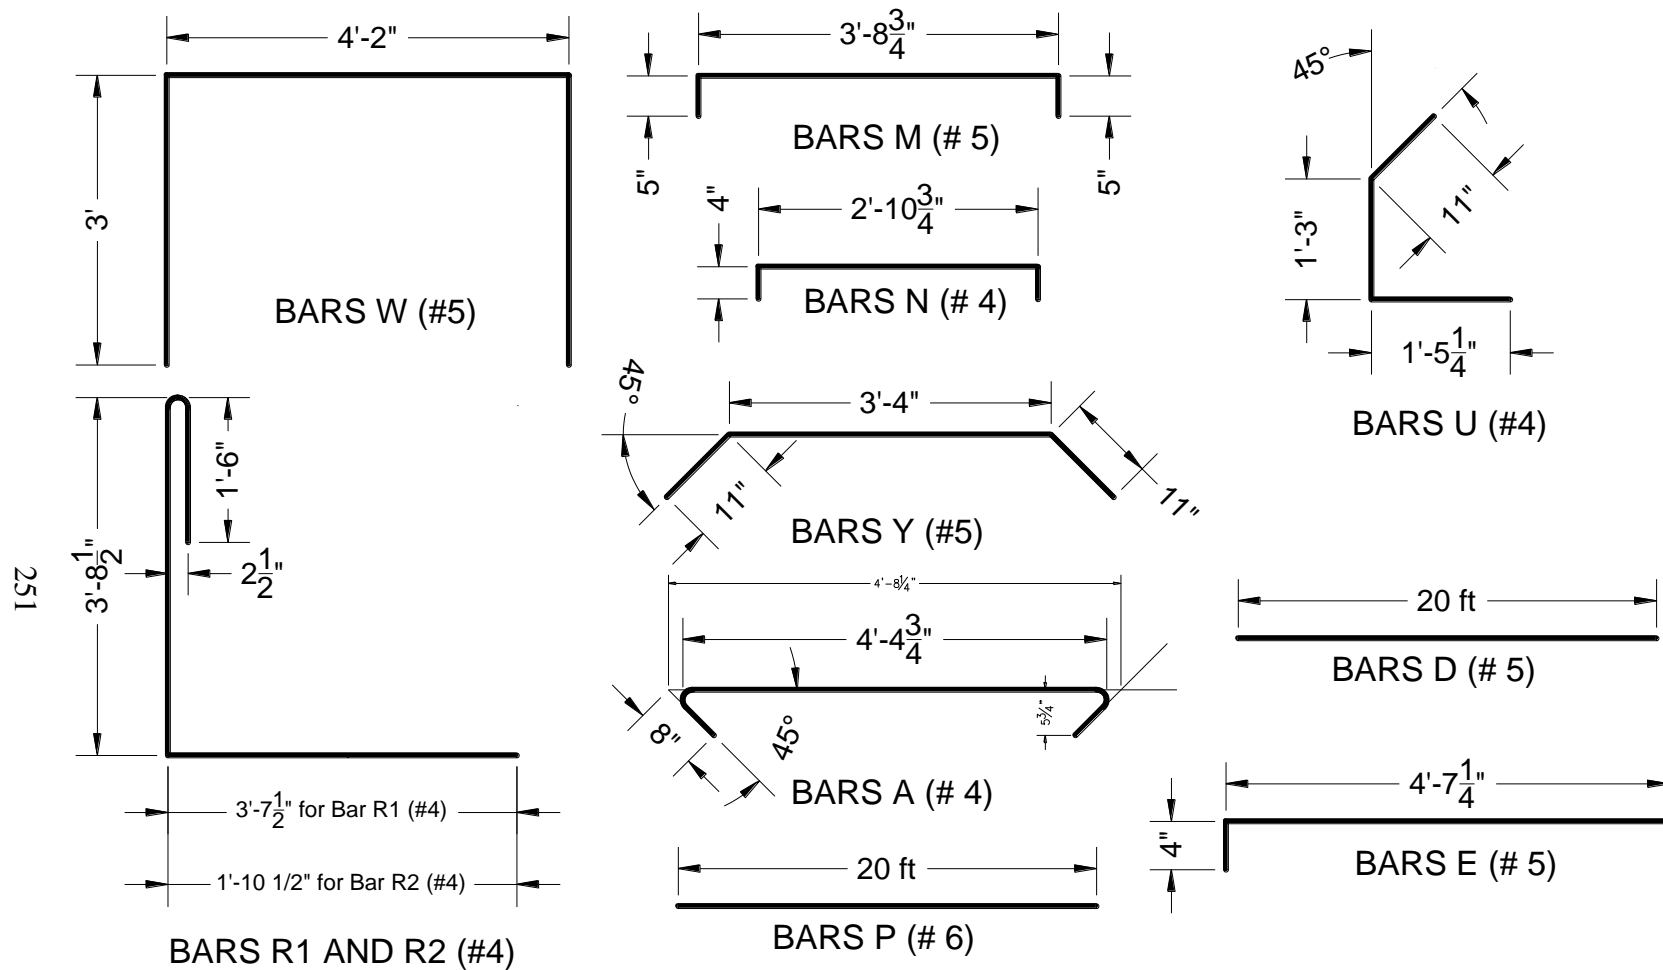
Reinforcement Bars Details. Beam 5XB40
